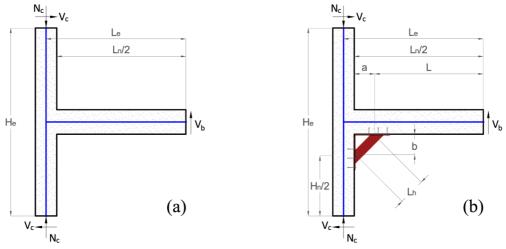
External actions on exterior beam-column joint: (a) Non-Retrofitted
